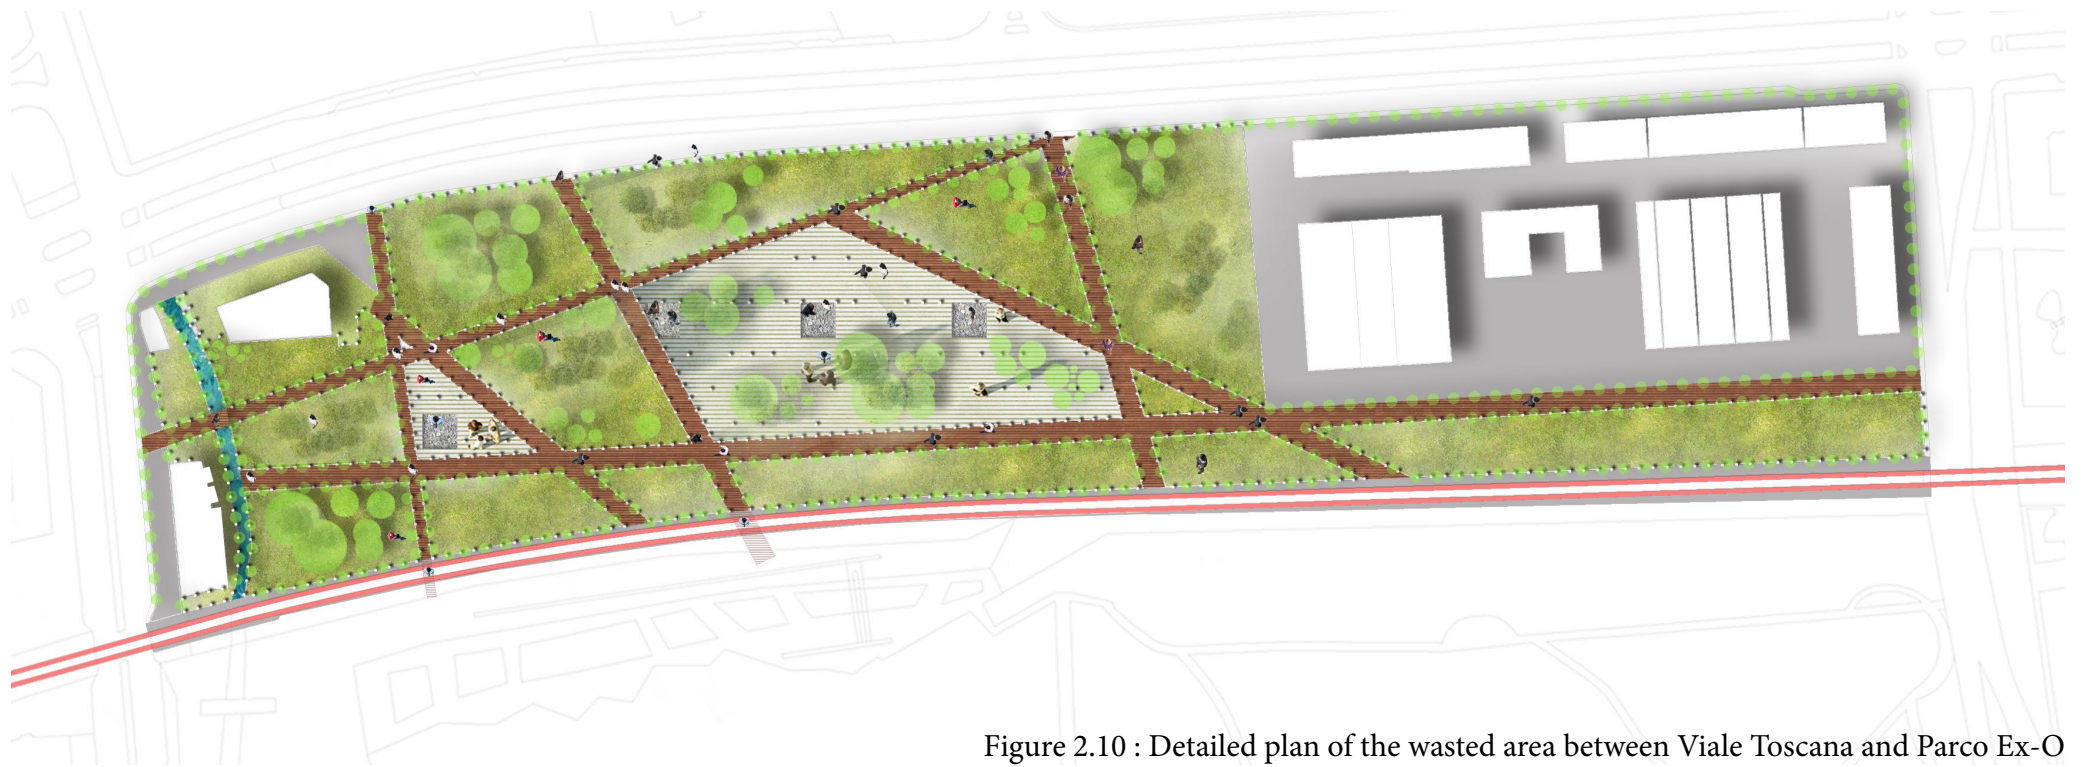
Detailed plan of the wasted area between Viale Toscana and Parco Ex-O
